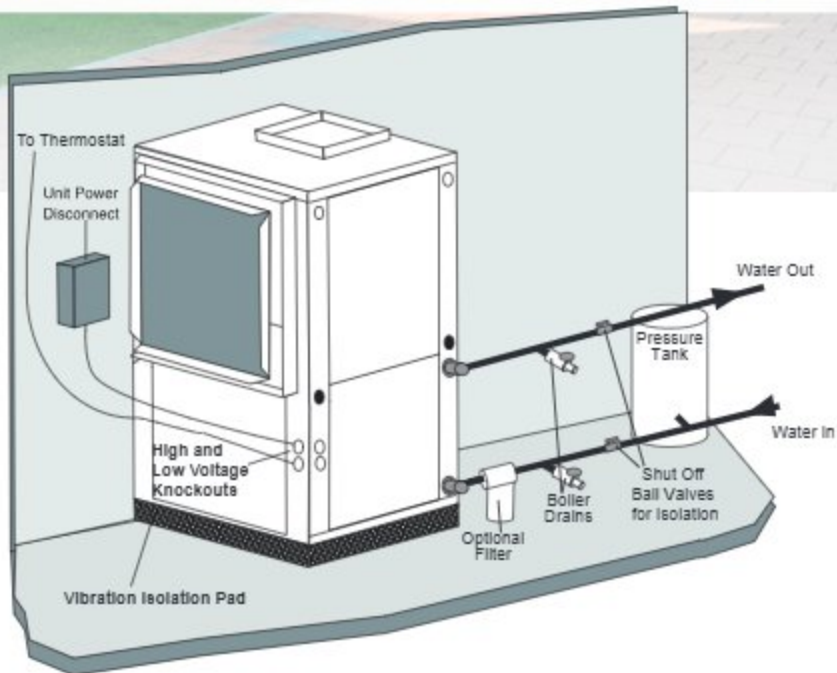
Ground Water Heat Pump Applications Typical Open Loop/Well
